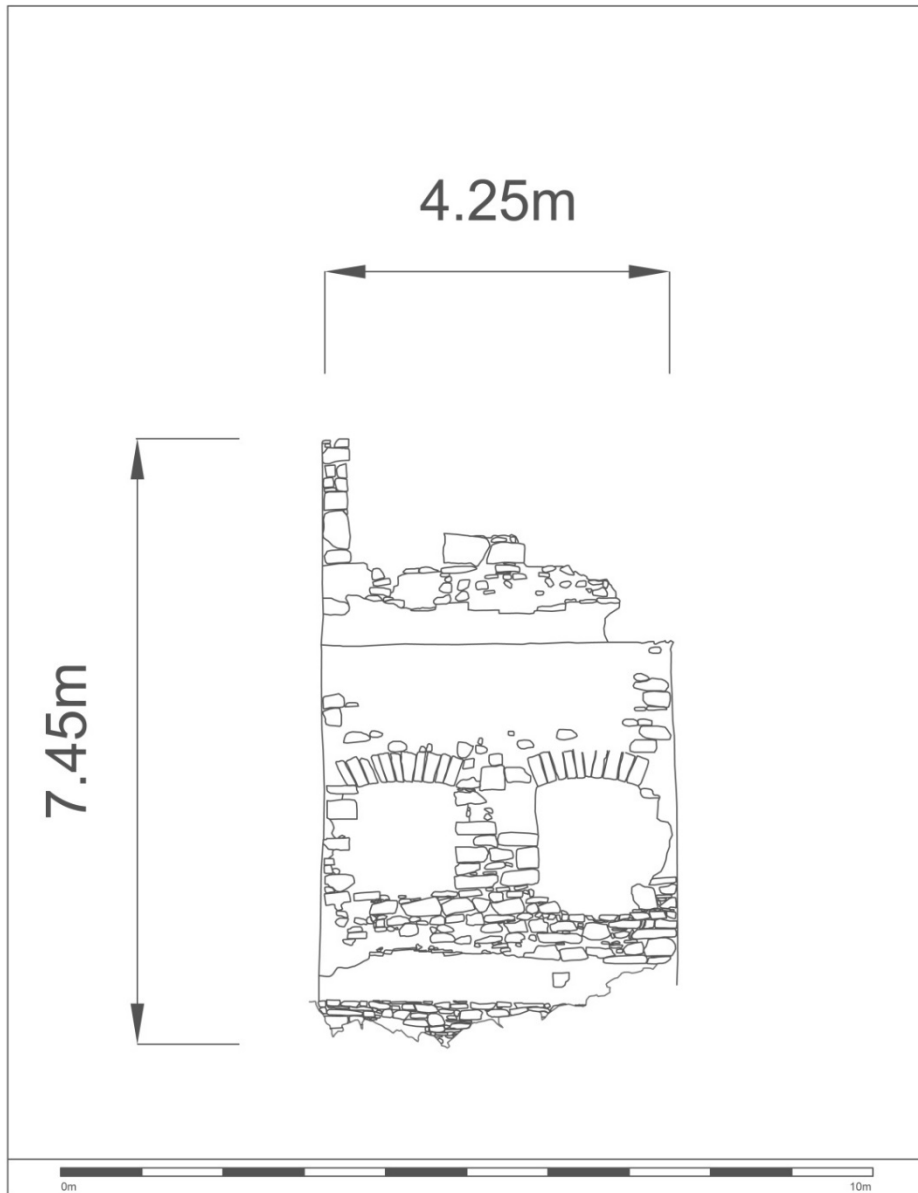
Internal elevation of the north wall of Clare Island Signal Tower.
